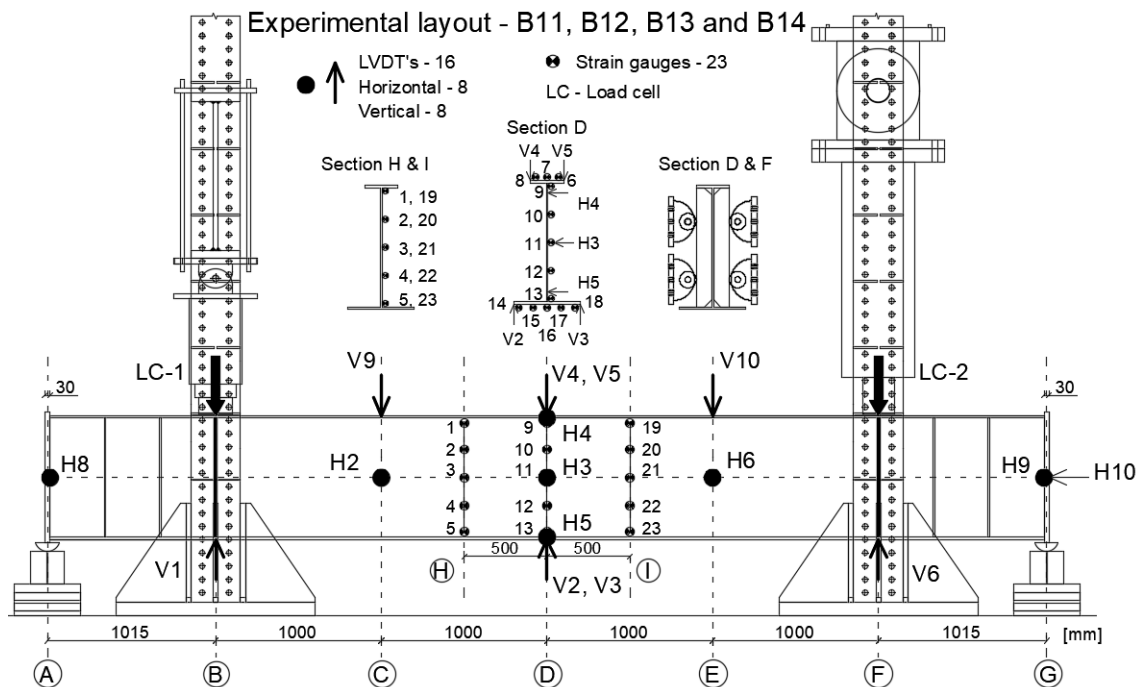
Experimental layout and instrumentation – tests B11, B12, B13 and B14
